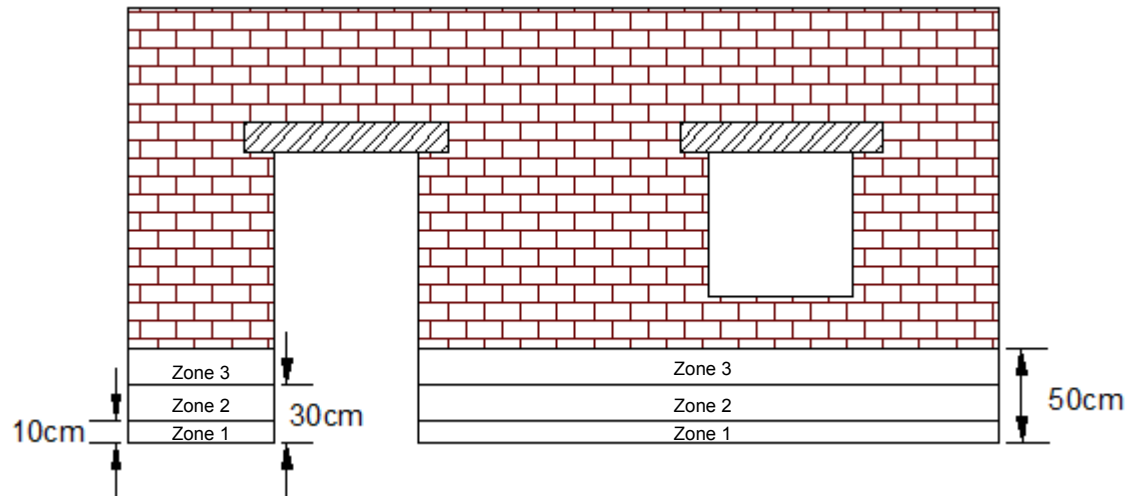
Side view of typical masonry wall showing the 3 longitudinal deterioration zones at the base.
